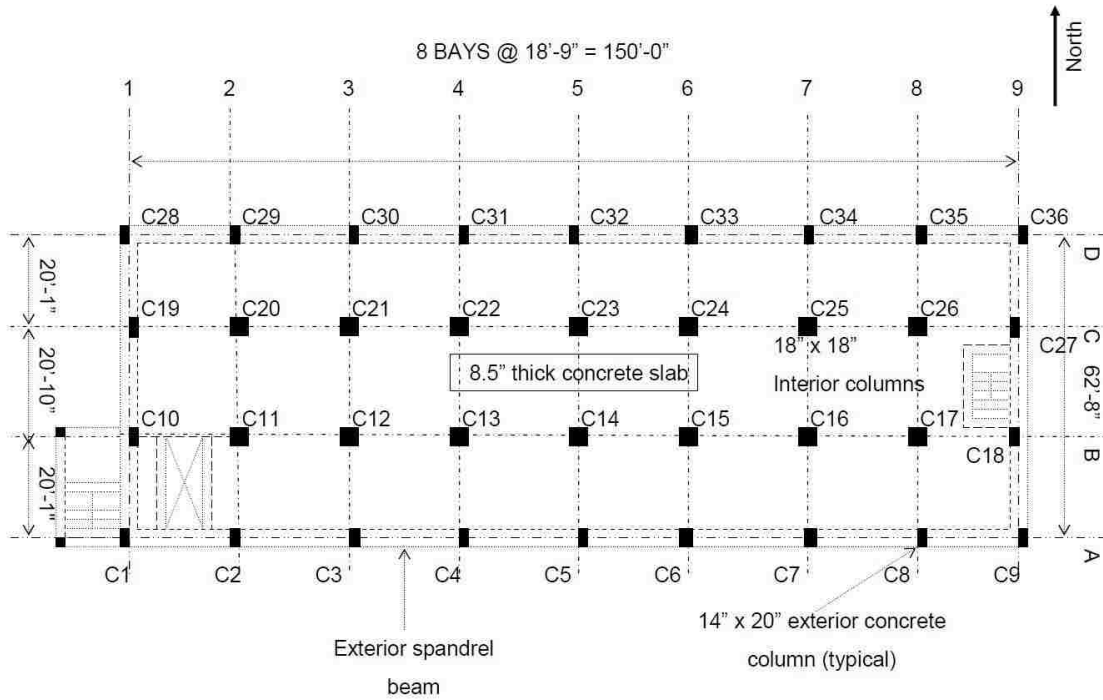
Van Nuys building floor plan (Paspuleti 2002)
